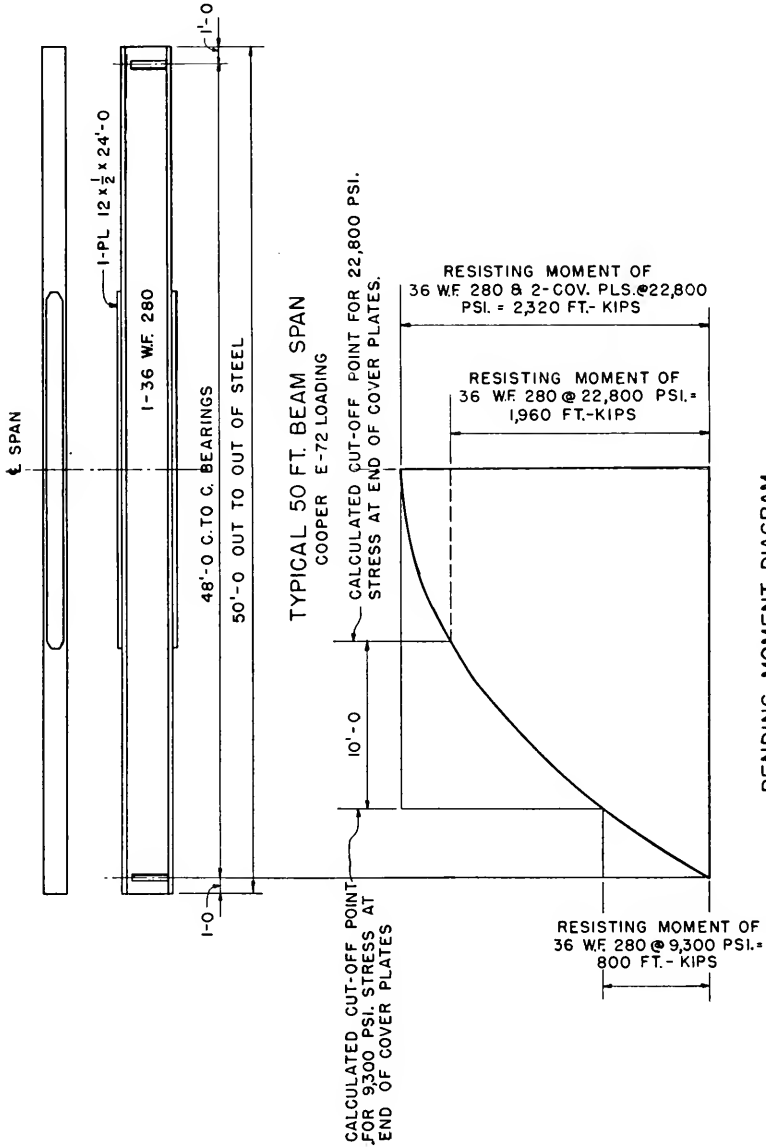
Determination of cover plate lengths. 50-ft. welded beam span. Ballasted timber floor.
